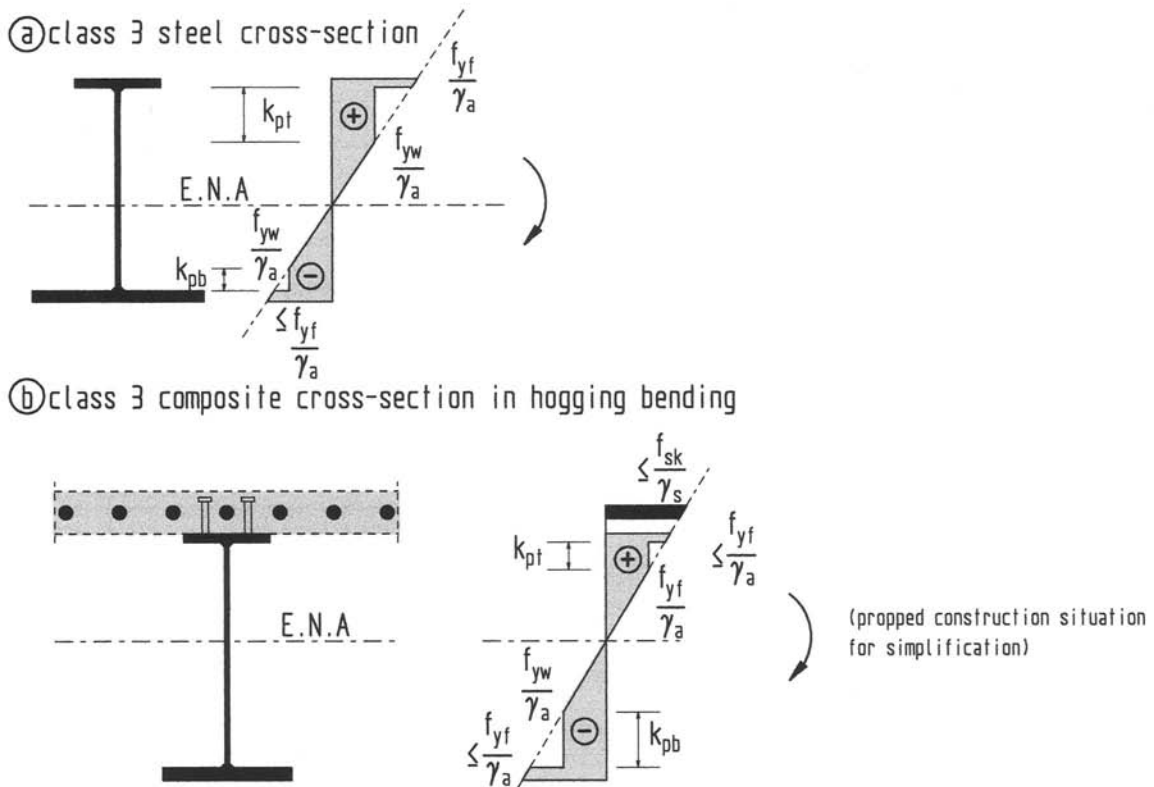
bending moment resistance of an elastic section for a class 3 steel and composite section
